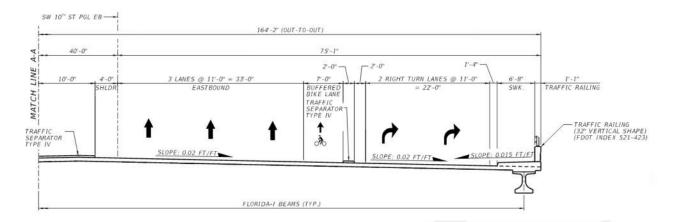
Bridge Typical Section (Bridge No. 12) 2 of 2
